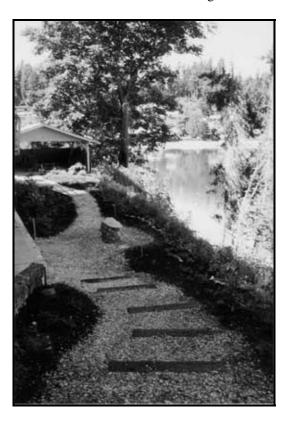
Path in front of house. Prior to construction this was part of the driveway, but narrowing the path allowed more room for laying back the slope.
